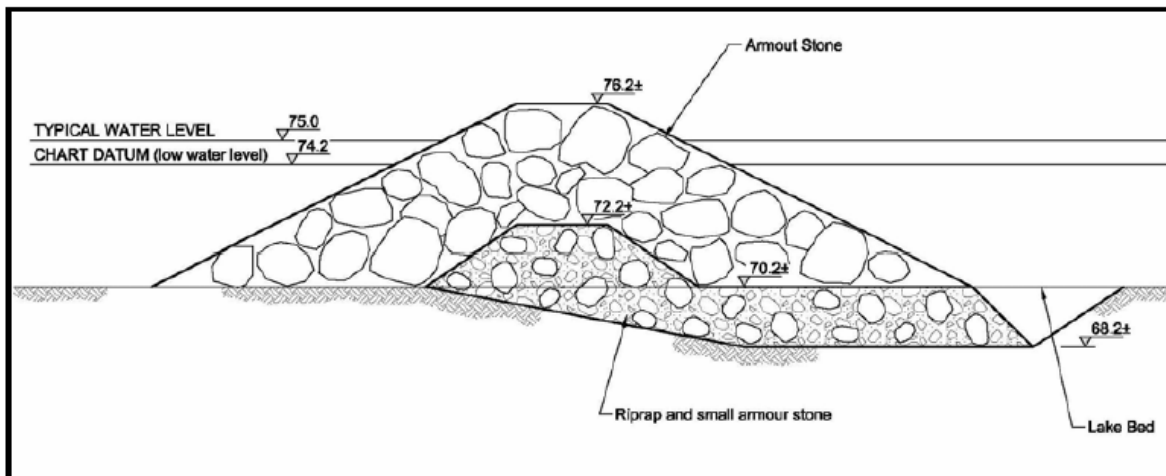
Typical breakwater cross-section. *Source: Shoreplan Engineering Limited, 2007.
